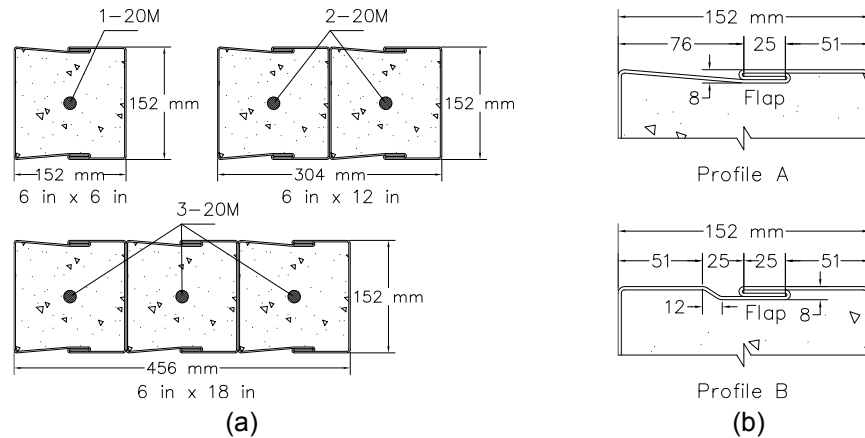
Column cross sections: (a) Typical cross sections (Profile A); and (b) Detail of profiles A and B.
